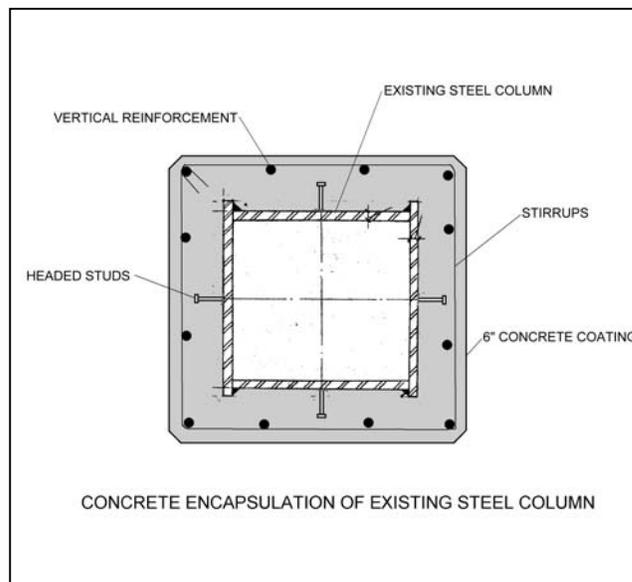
Concrete Encapsulation of Existing Steel Columns
